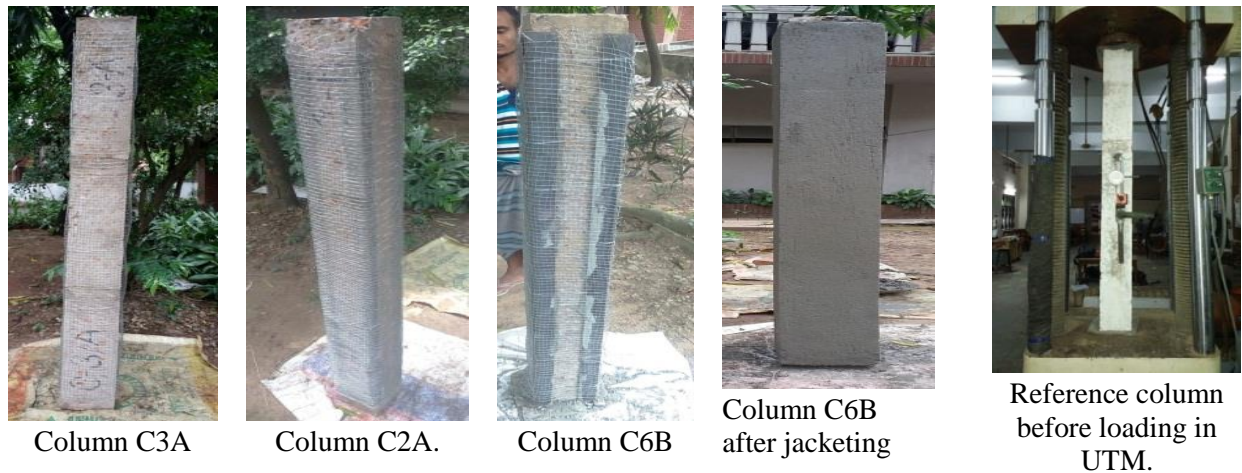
Different types of ferrocement jacketing techniques applying on RC columns and loading column during test.
